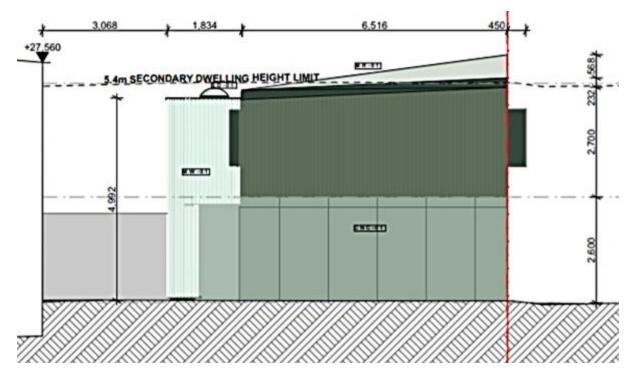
Original proposal - south elevation. Two storey form exceeds the DCP 5.4m height control.
